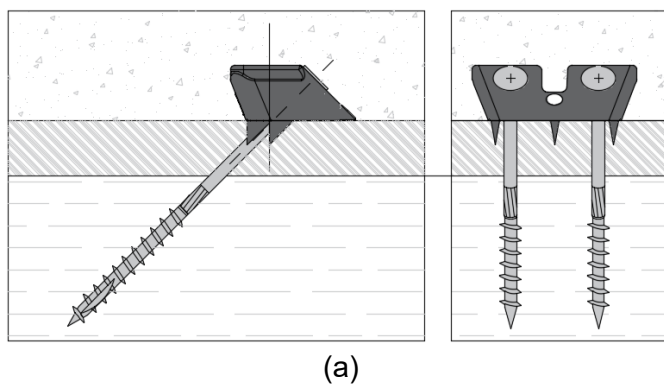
Detail of Connector and screw installation onto the timber beam.
